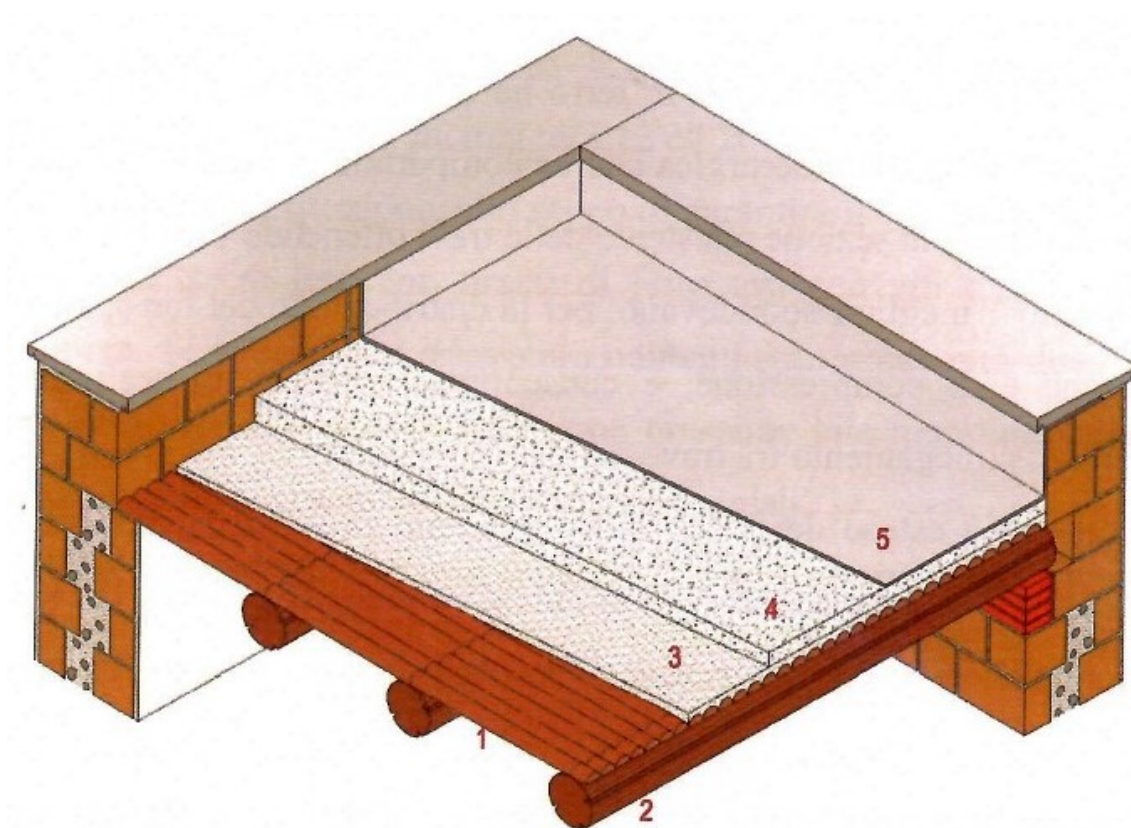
Wooden floor: 1) Main beam, 2) Secondary beams, 3) Mortar layer, 4) Slope screed, 5) Waterproofing layer.
